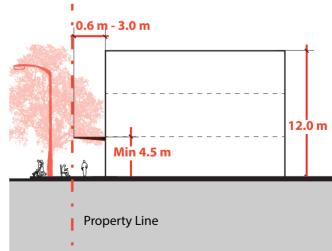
Maximum building height of 3 storeys or 12.0 m.
